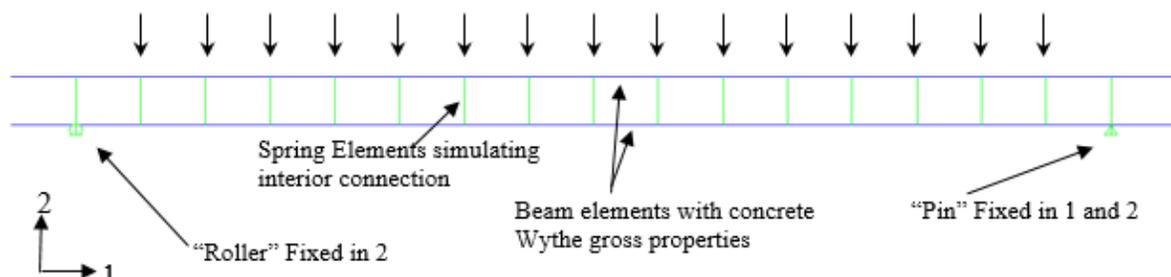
Beam and Spring Model used to model Naito 2009 Full Scale Specimens
